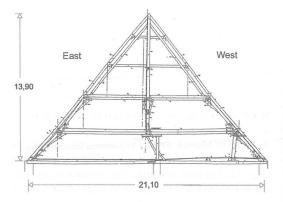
Cross section (Drawing of Franz Hölzl, Munich)
